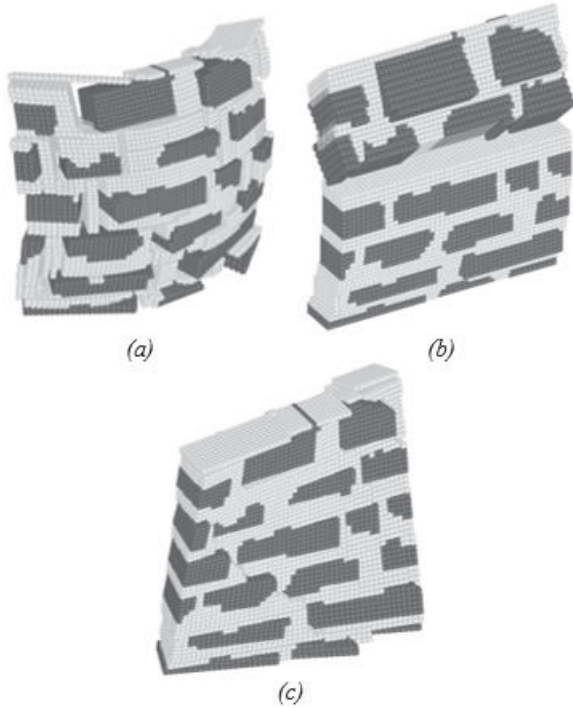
Failure modes for relevant out-of-plane load conditions applied to case (c)
